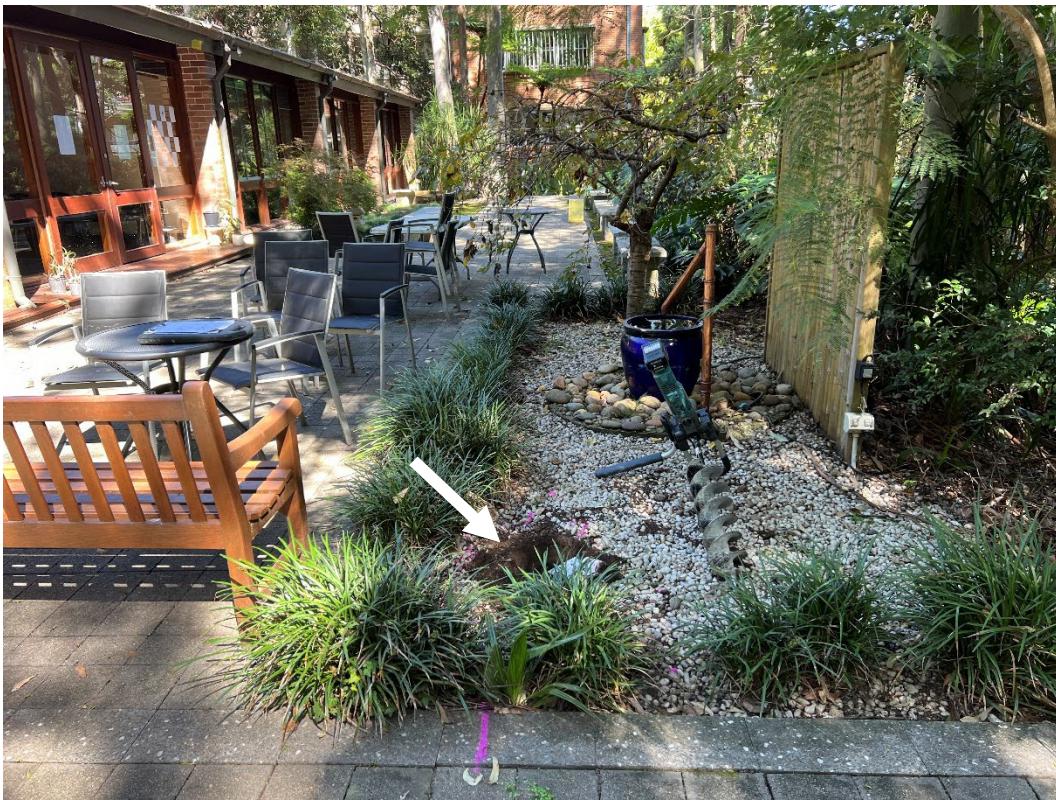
Showing borehole BH4 sampling location, looking south, 05.04.2025.
